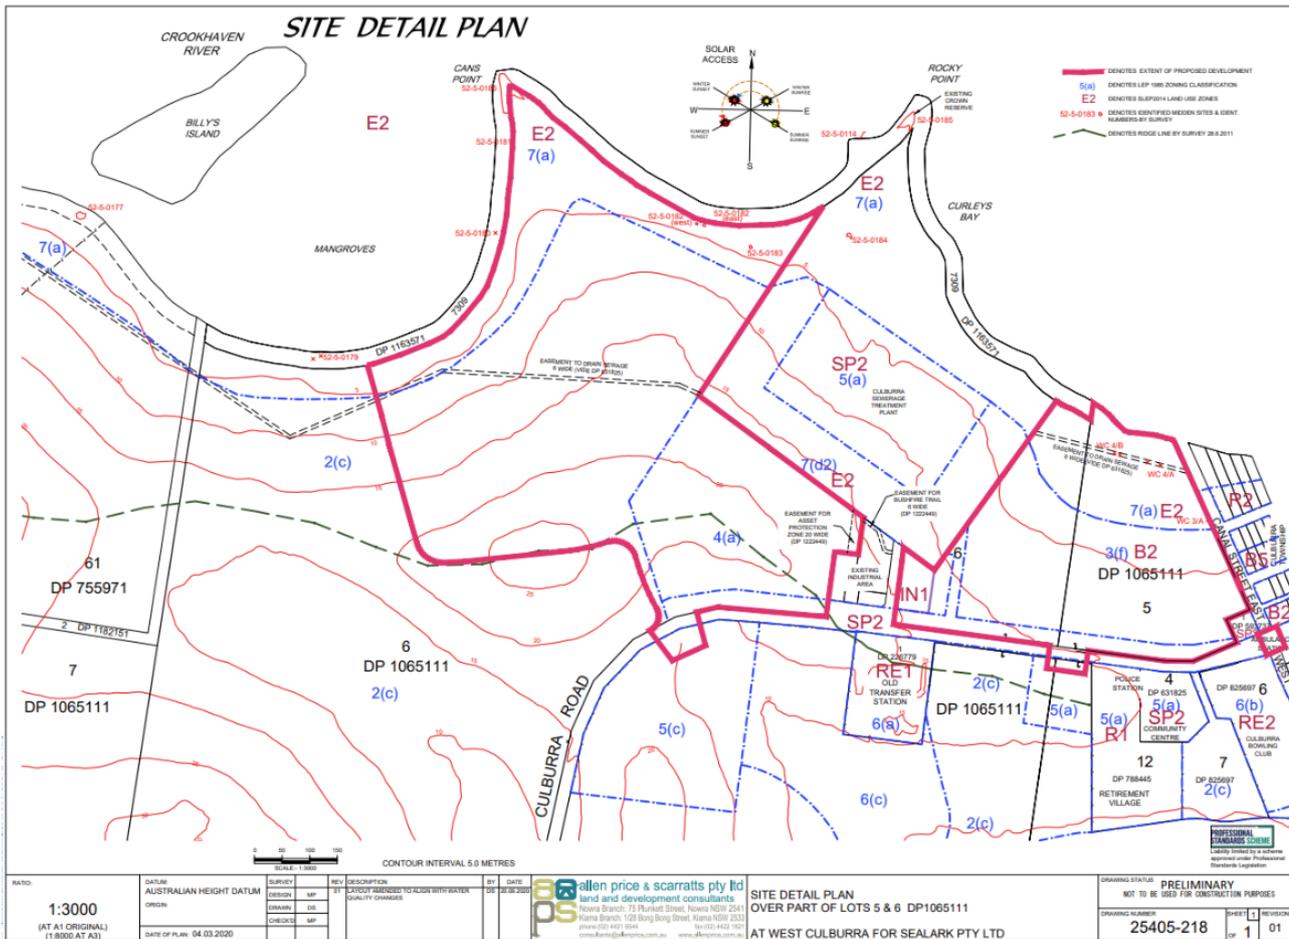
Approved Site Detail Plan - Dwg No. 25405-218 (Source: Allen Price & Scarratts)
